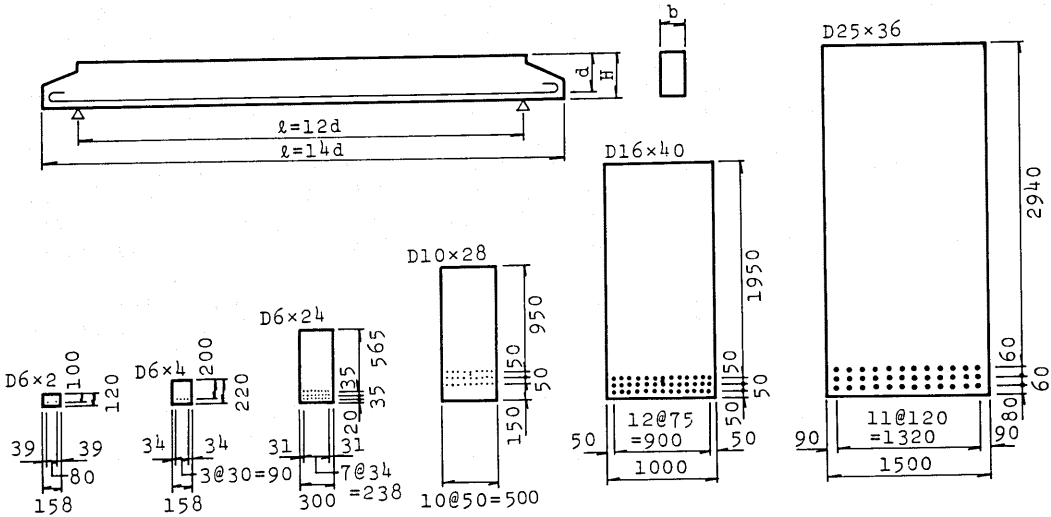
Cross-sectional dimensions and reinforcing bar arrangements of specimen.
